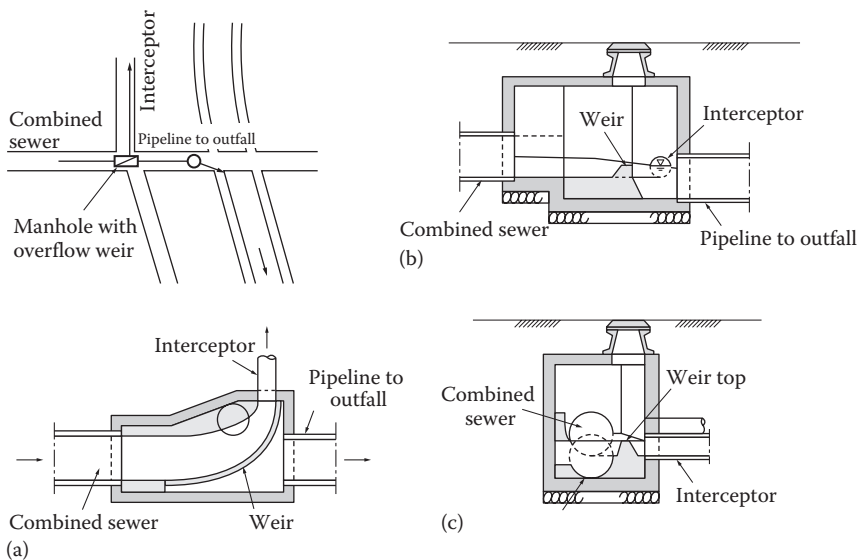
Example of storm outfall: (a) plan, (b) longitudinal section, and (c) cross section.
